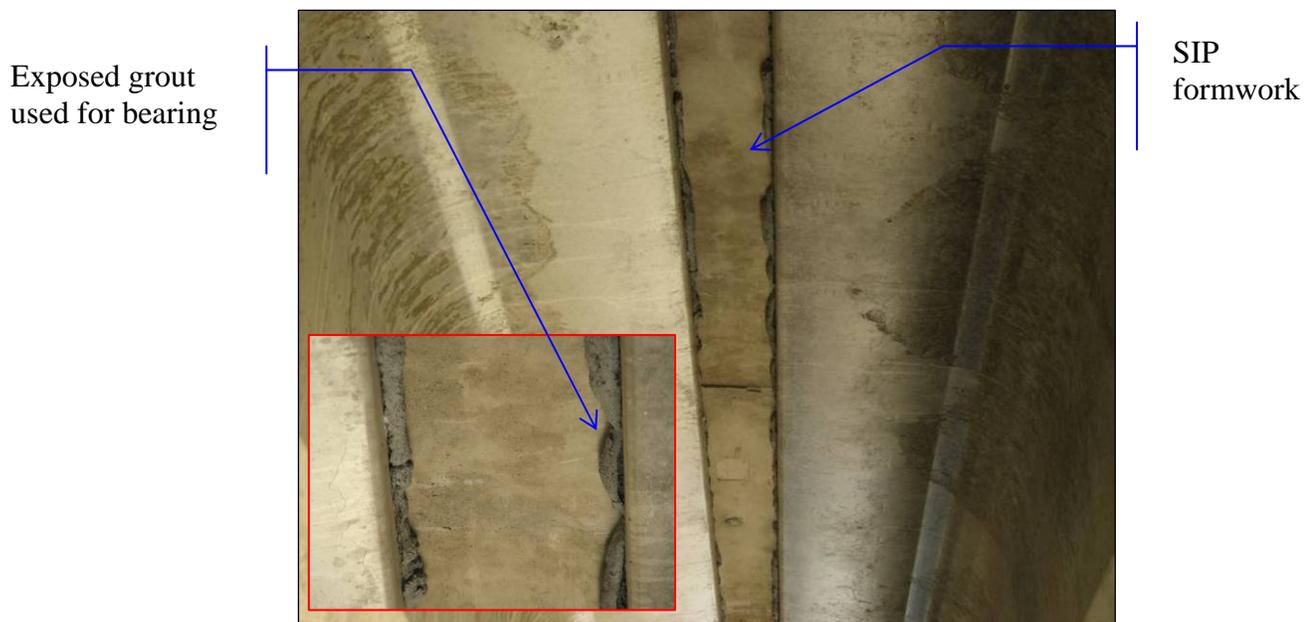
Contractors SIP Formwork Proposal (Courtesy – Lunda Construction)
